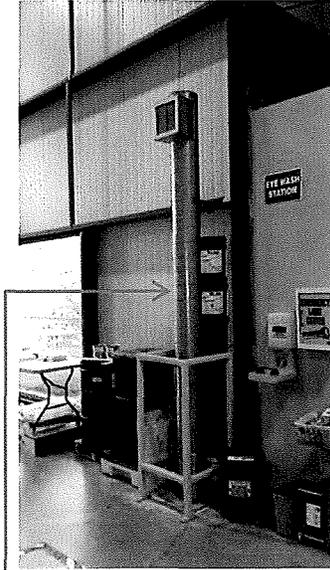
1301 Canal; typical supply air duct, column C5 .
